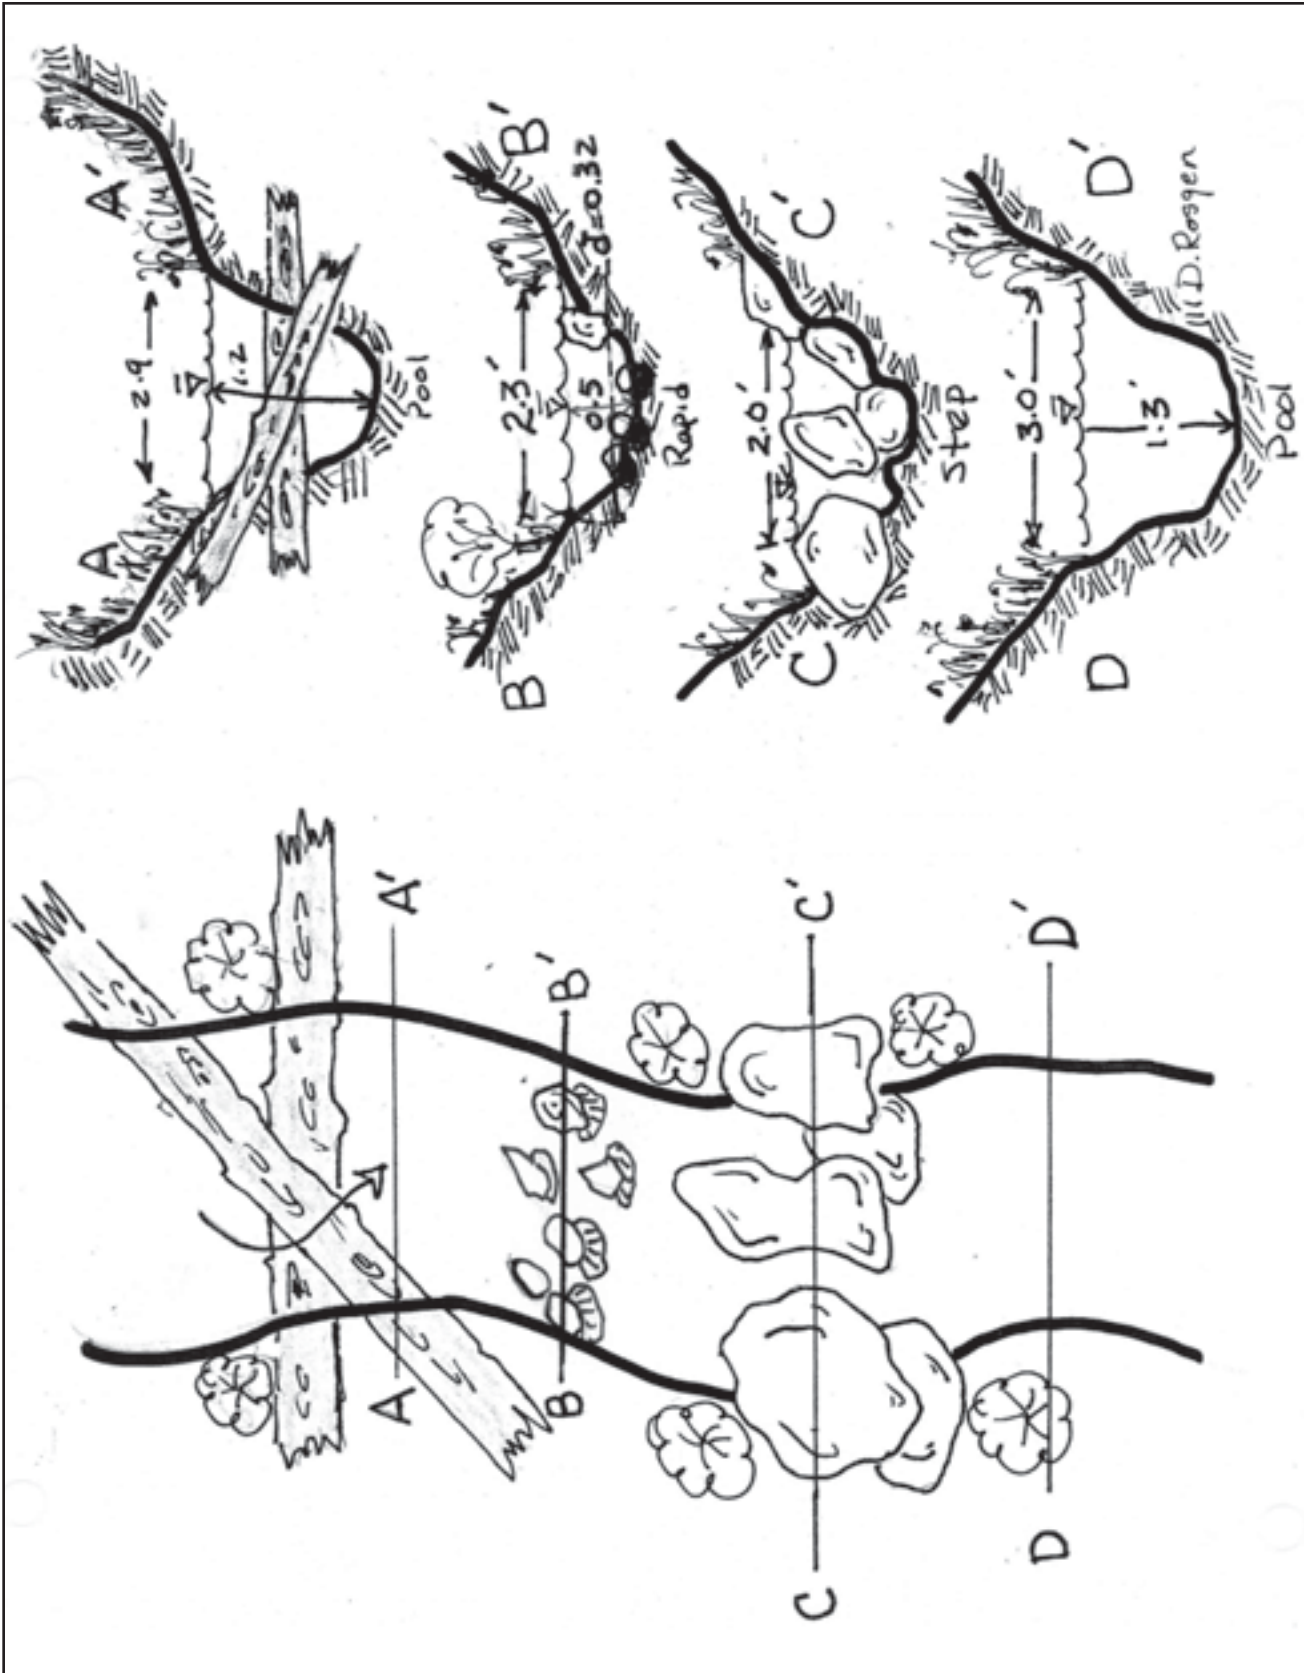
Typical plan view alignment with corresponding cross-section dimensions and structure locations.
